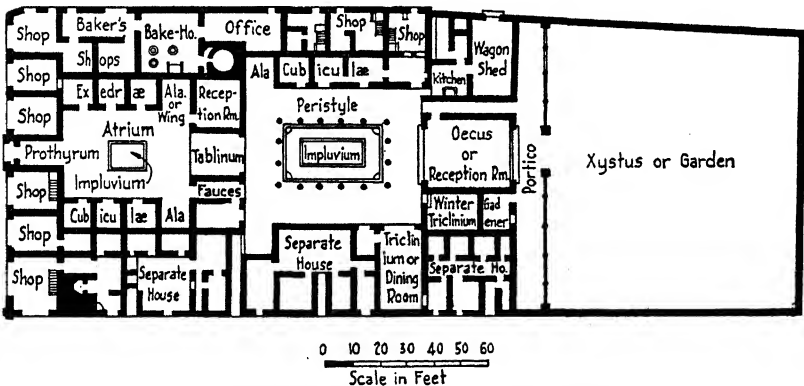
PLAN, HOUSE OF PANSA, POMPEII
